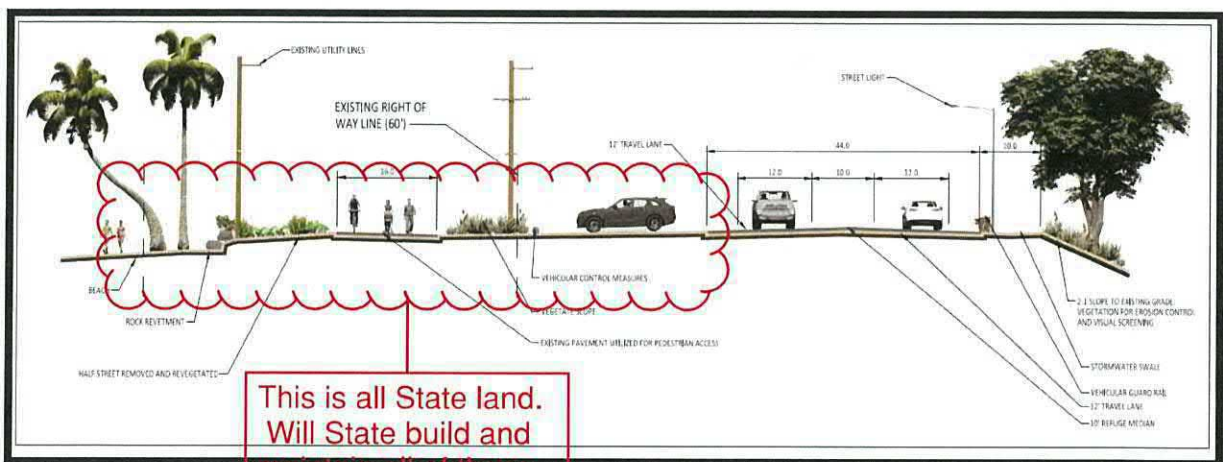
Pedestrian Shift Alternative Alignment Typical Section
